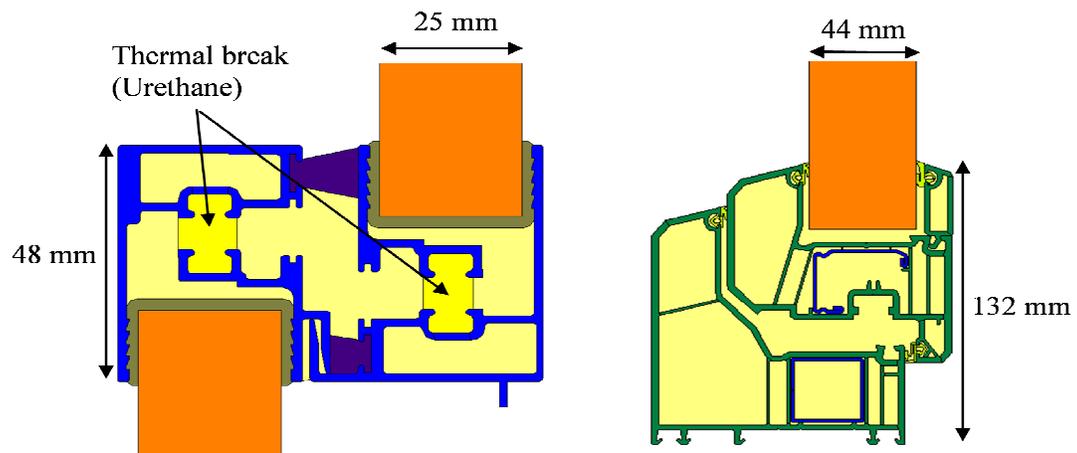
Cross section of aluminum frame, S3 (left) and PVC frame, S4 (right)
